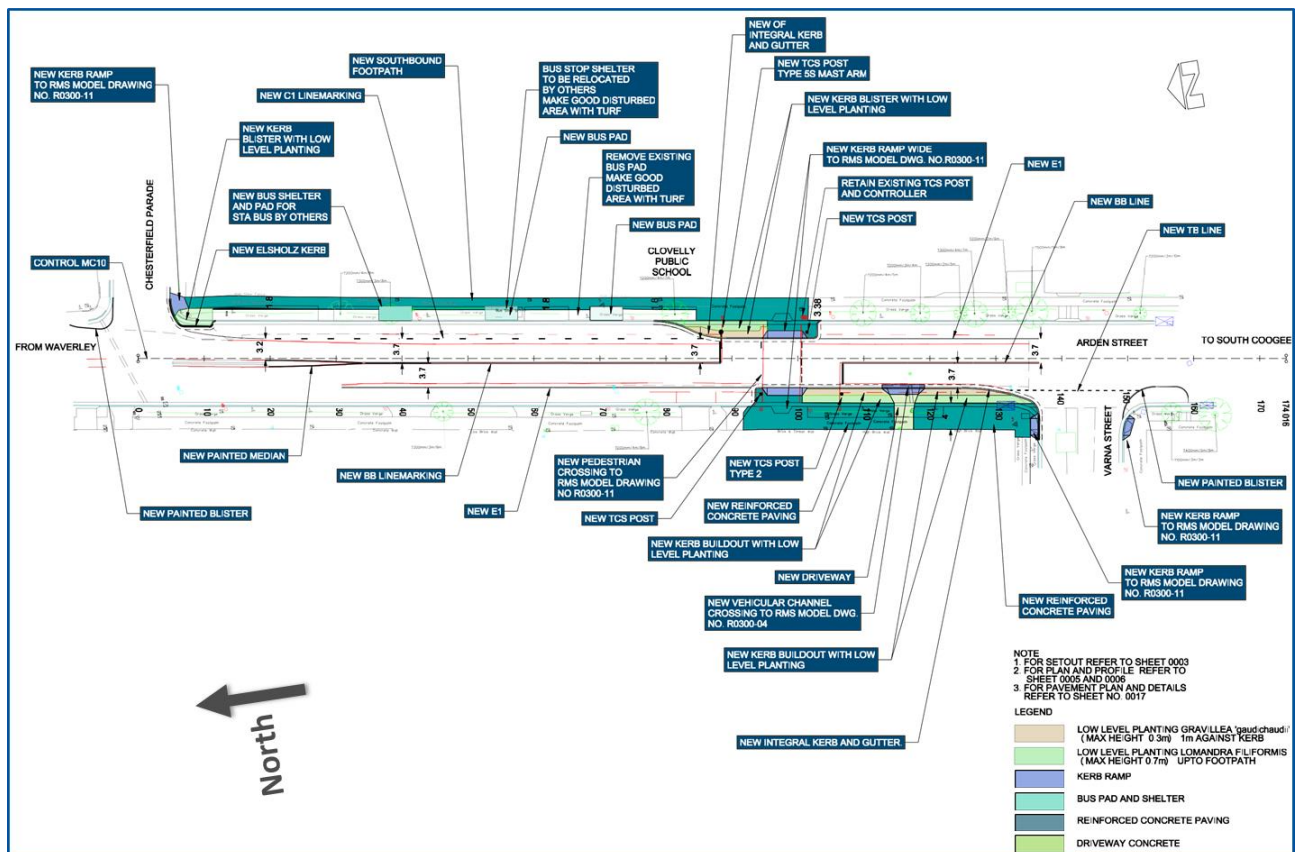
100% detailed design – Arden Street between Varna Street and Chesterfield Parade (see Attachment 2 for more details).
